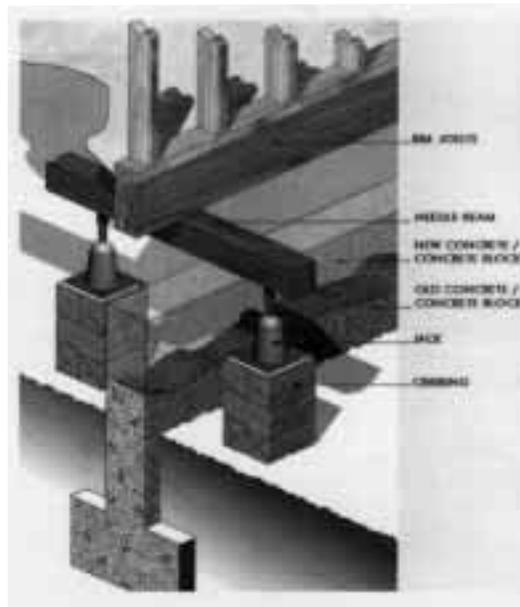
JACKING A WALL WITH PARALLEL JOISTS
